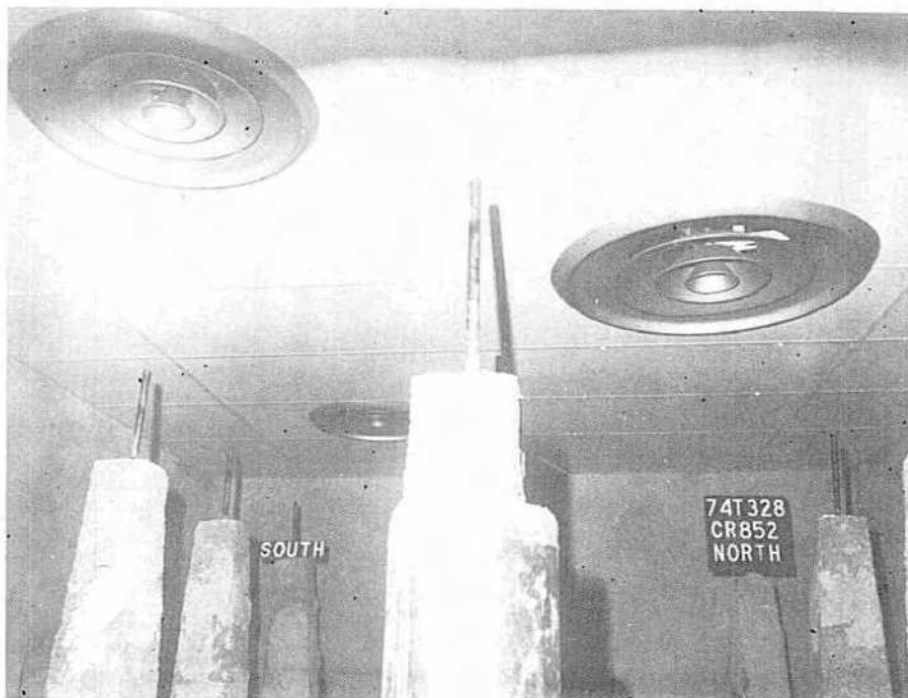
EXPOSED SURFACE BEFORE FIRE TEST, ASSEMBLY NO. 2
